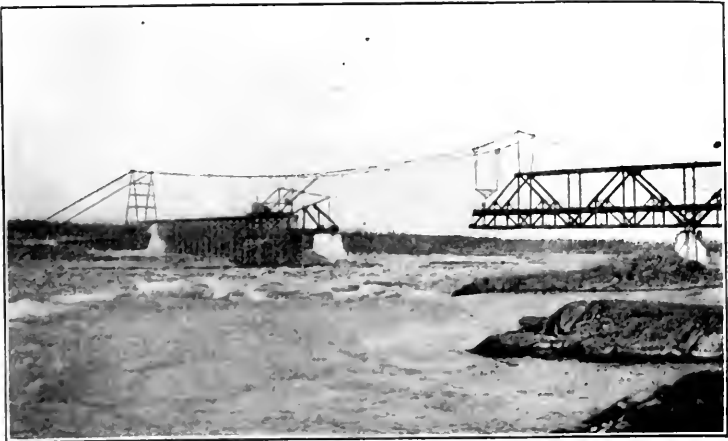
View of cableway; and beginning of erection of northern anchor-span, with traveller at floor level.
